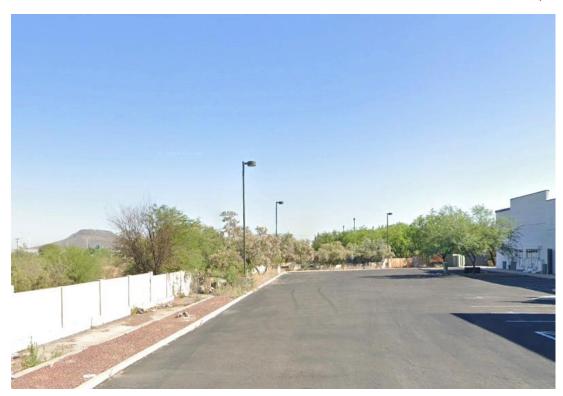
View of the rear PAAL, employee parking, perimeter masonry wall, landscape border, and drainageway along the western edge of the project site looking north
